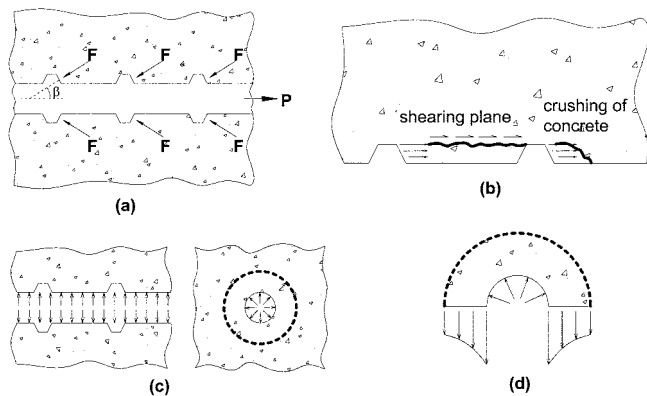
Forces on concrete exerted by deformed reinforcing bars.
